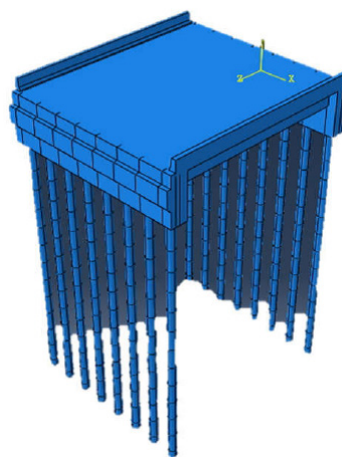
3D Finite Element Model of Integral Abutment Bridge.
